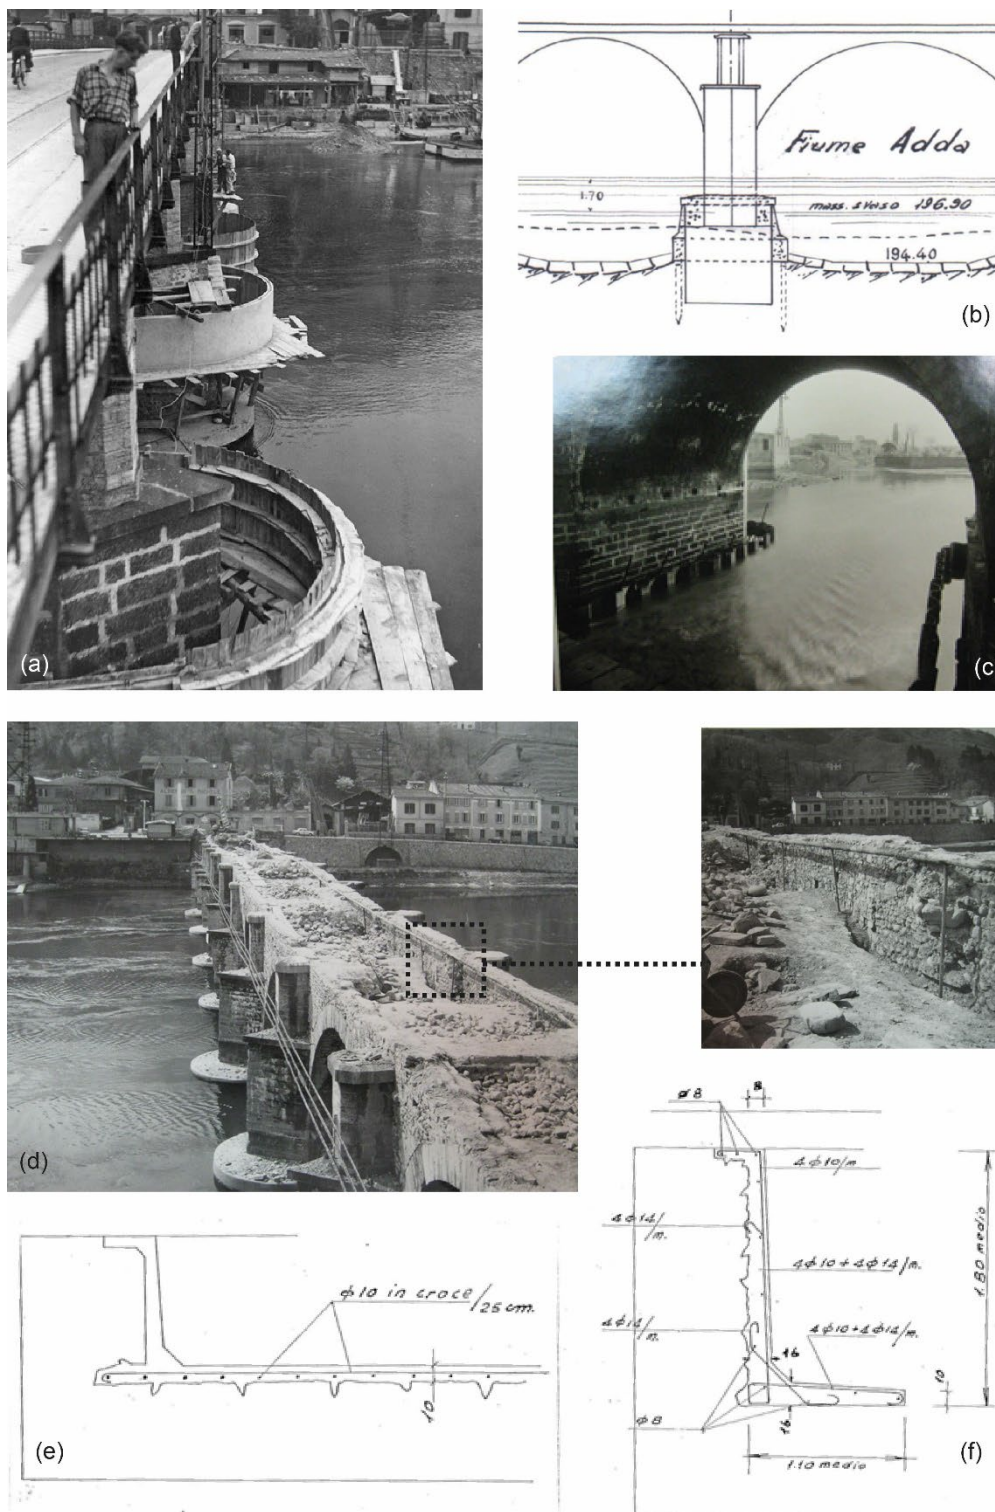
(a-c) Strengthening works at the foundations in 1949-1950; (d-f) consolidation works in 1959-1960; (a-c) placement of the steel encasing ring and of the reinforcing concrete ring; (d) fill removal between spandrel walls and arches; (e) consolidation of the upper part of the arches and (f) consolidation of the spandrel walls. Courtesy of Lecco Municipality, “Consorzio Fiume Adda” and “Soprintendenza belle arti e paesaggio”.
